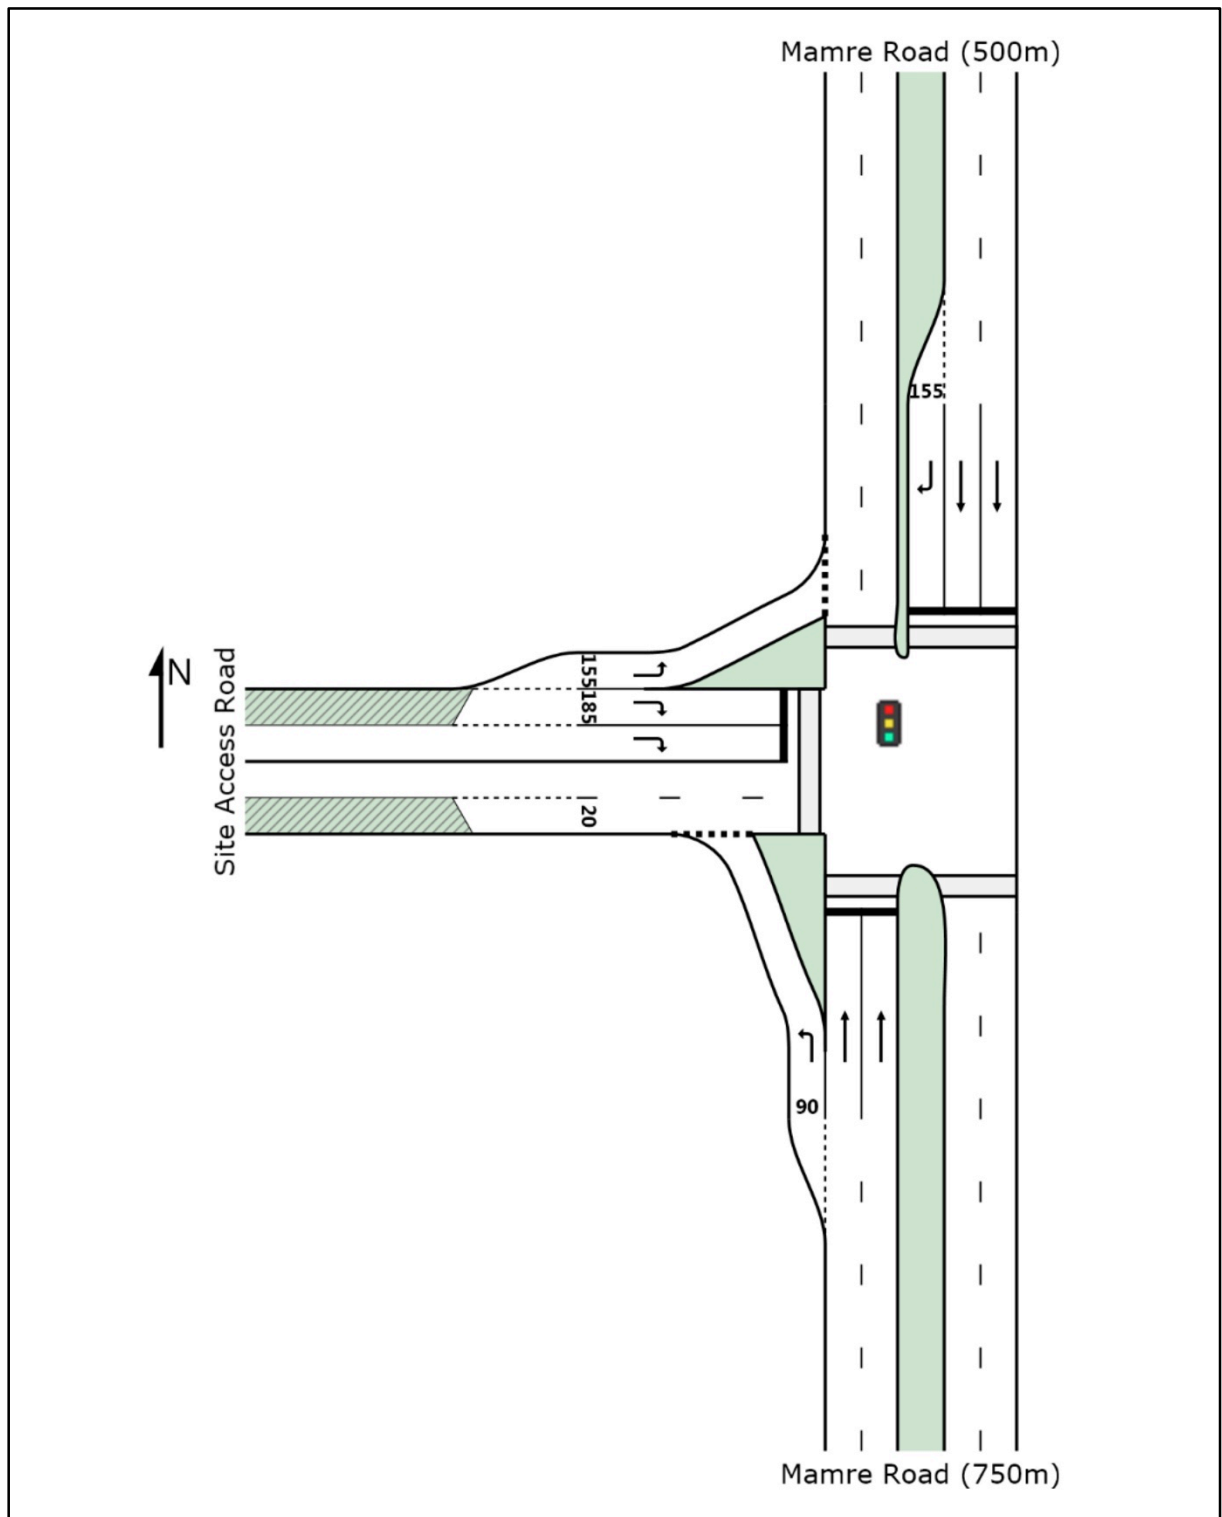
Proposed Intersection of Mamre Road with the Site Access Road (Option 1)
